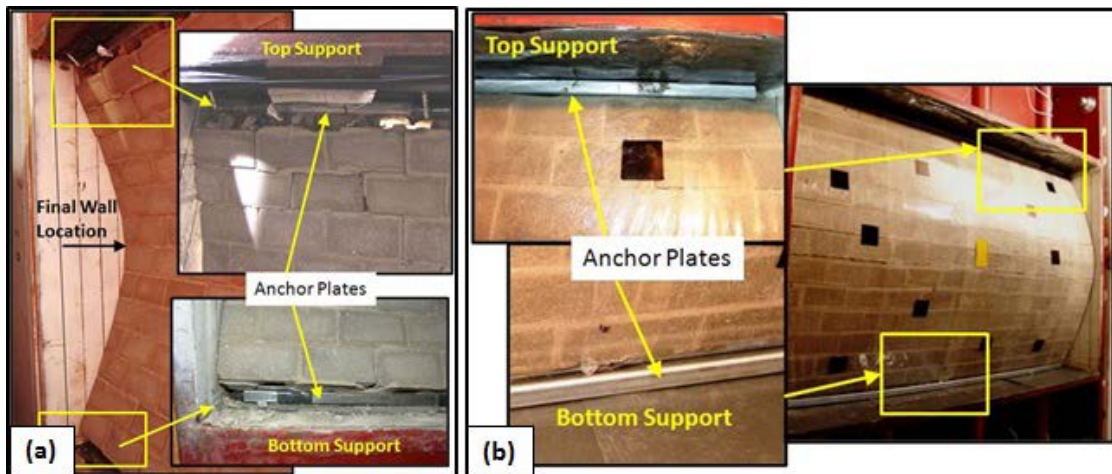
BLS6. (a) Final position of CMU wall with anchor plates visible. (b) Interior view of anchor plates.
